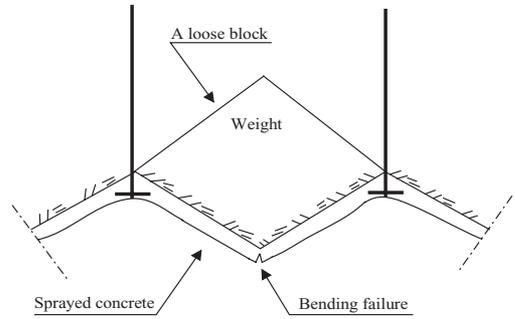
Failure in a bolt-supported shotcrete lining on rock (Chang 1994).
